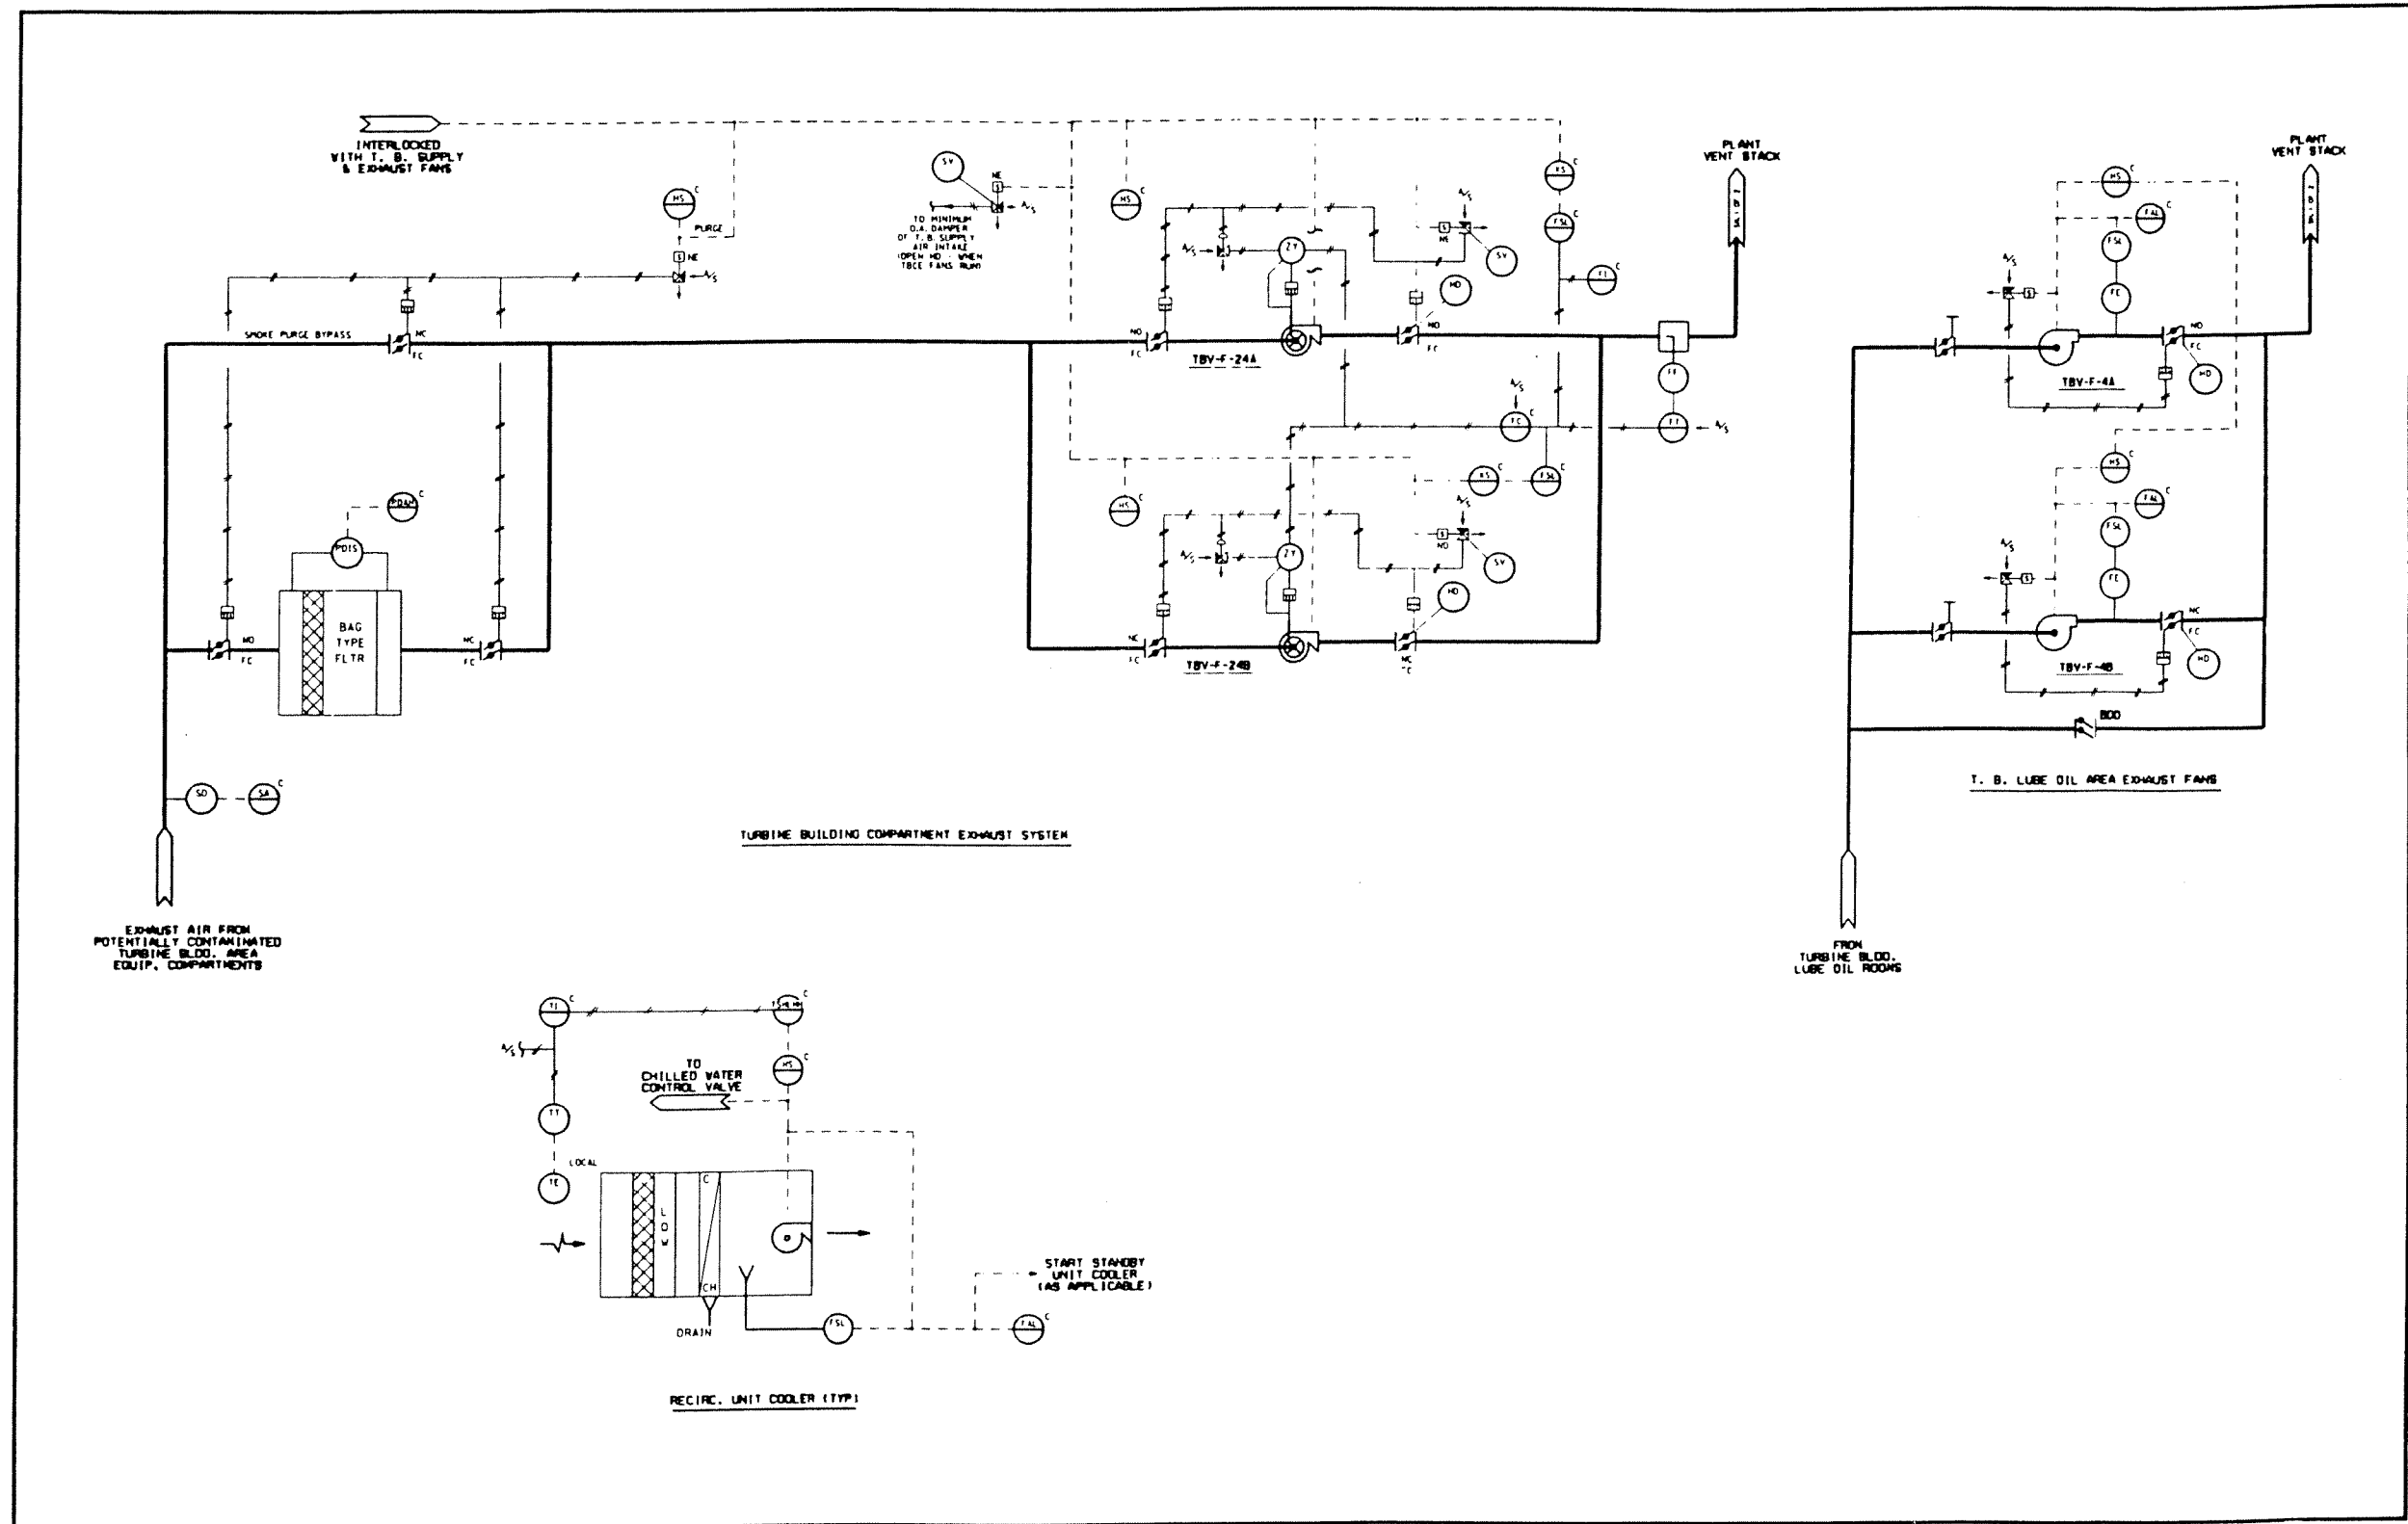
TURBINE BUILDING VENTILATION SYSTEM, CONTROL DIAGRAM, Sheet 2
